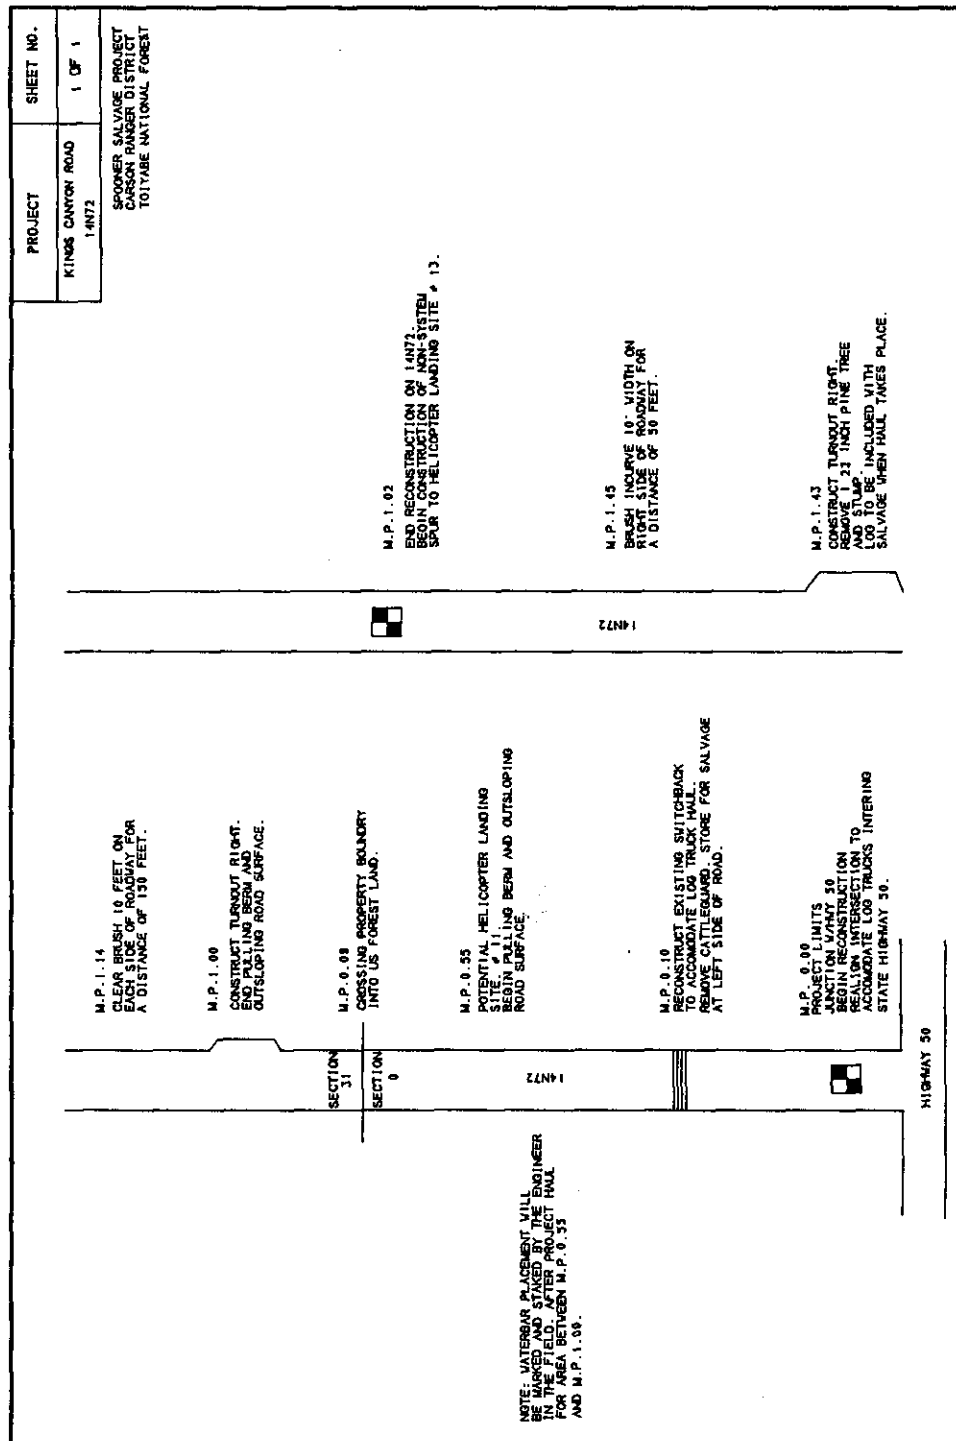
DETAIL DRAWING FOR SWITCHBACK RECONSTRUCTION AT M.P. 0.10 ON THE KINGS CANYON ROAD (SUBMITTED BY THE CARSON RANGER DISTRICT AUGUST 1993)
